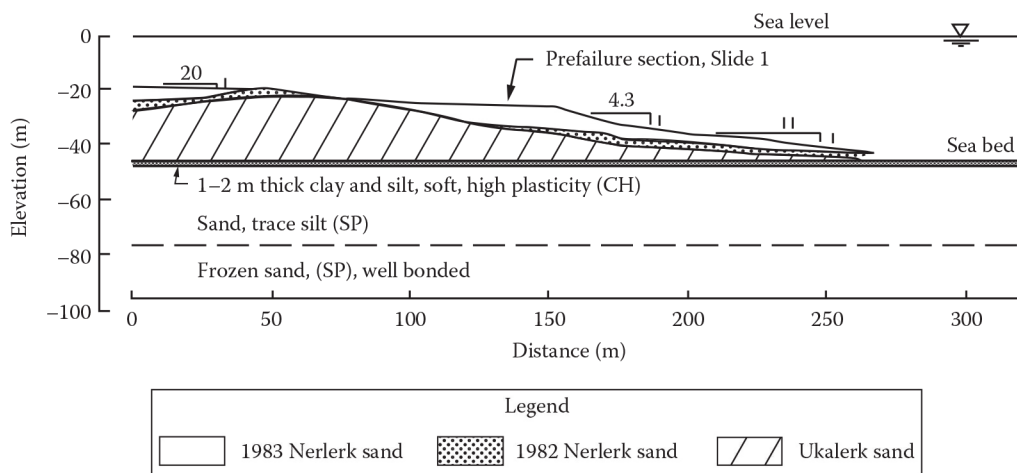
Cross section of the Nerlerk B-67 berm and foundation, from Been et al. (1987).
